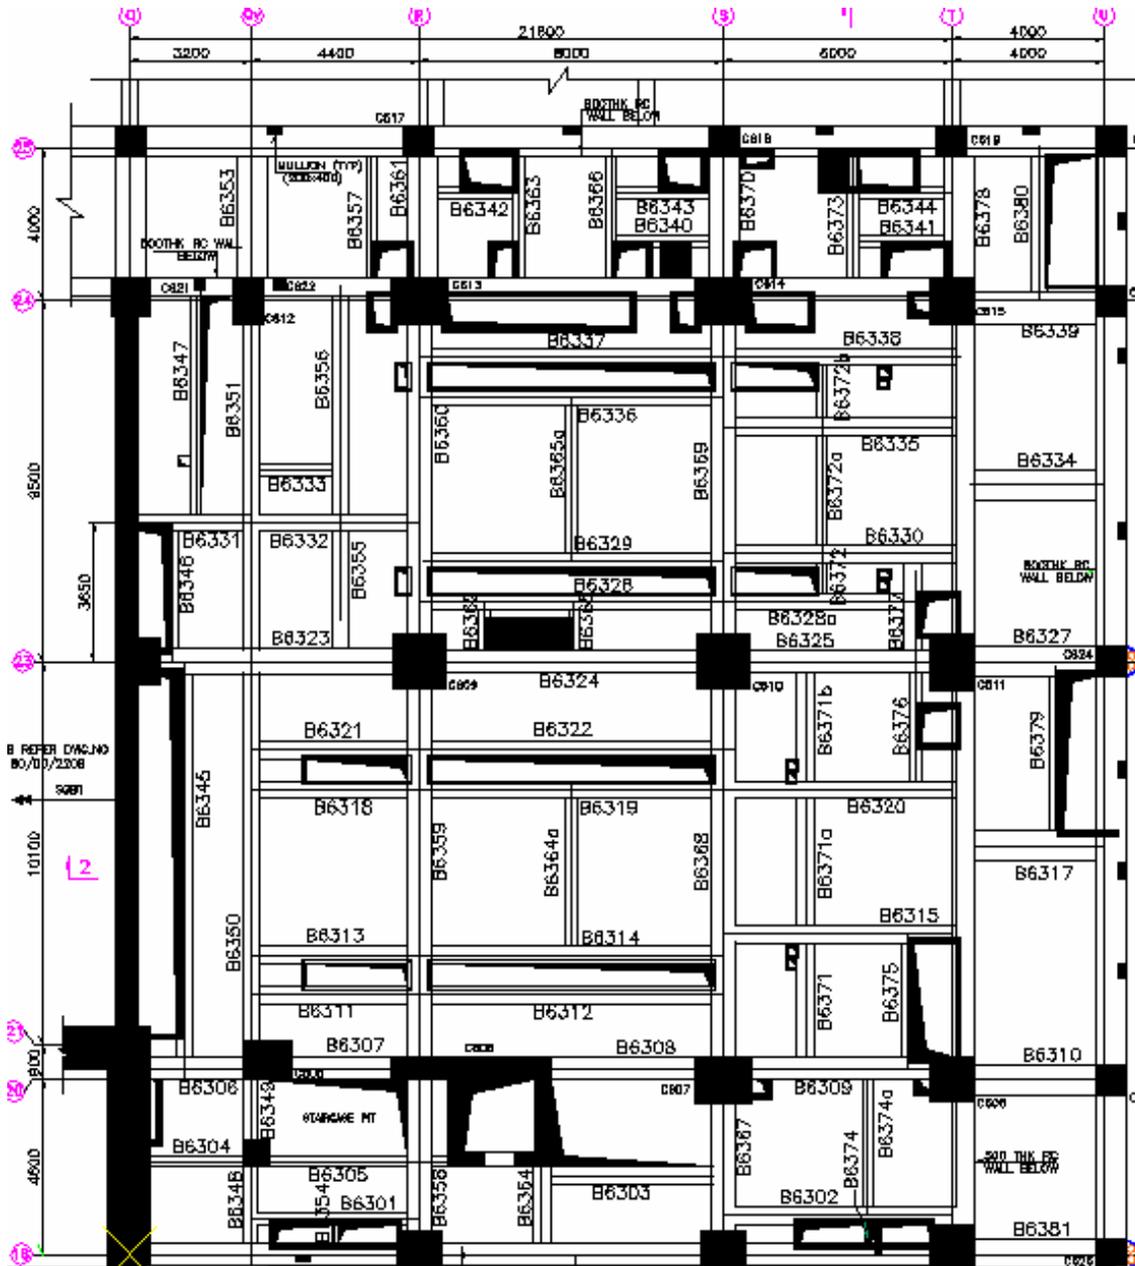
Layout of Primary and Secondary Beams in EB1 at EL 30000
